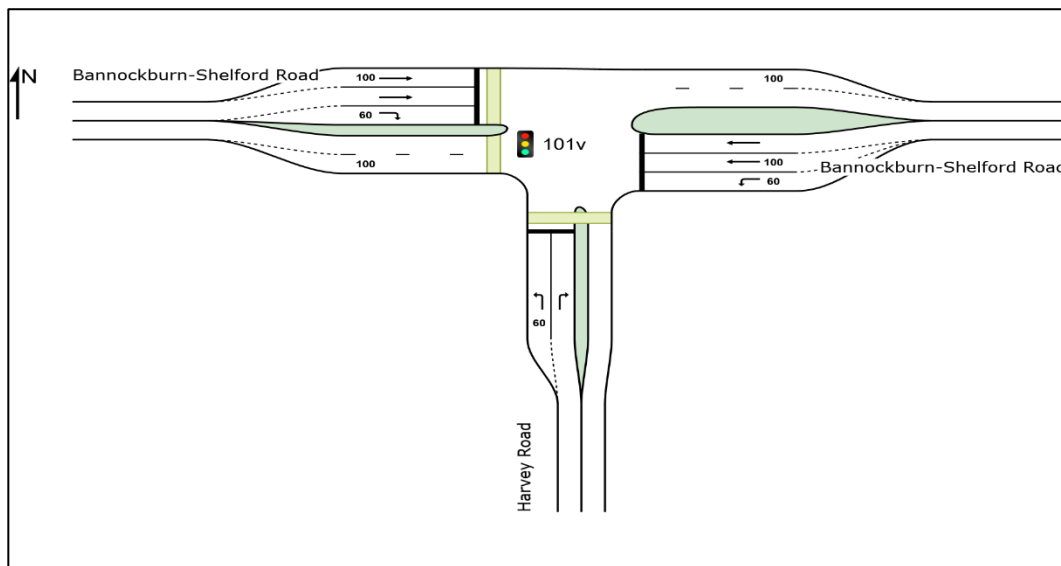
Harvey Road / Bannockburn-Shelford Road SIDRA intersection layout
